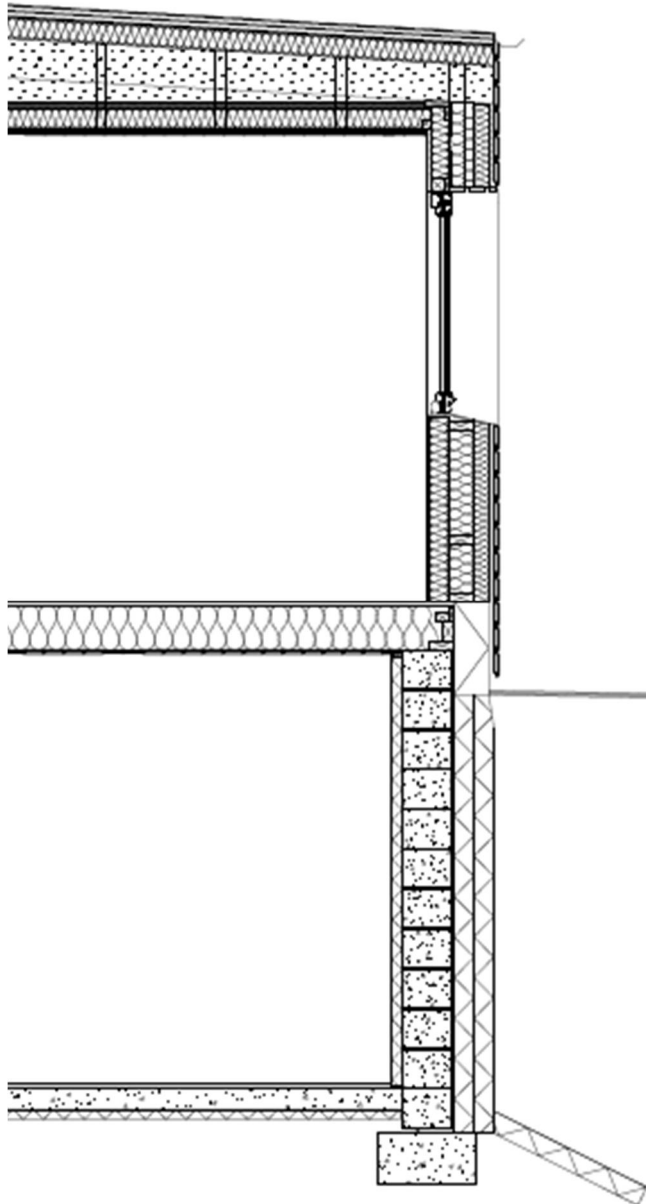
Section drawing of RH1b after renovation with Passive House renovation package.
